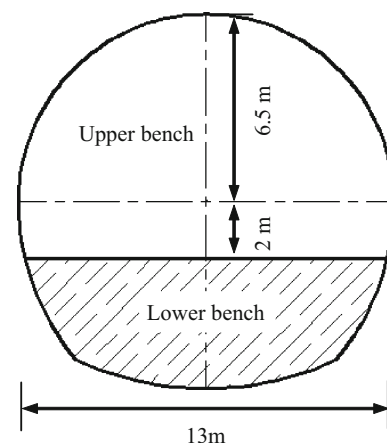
The excavation scheme for the headrace tunnels #2 and #4
